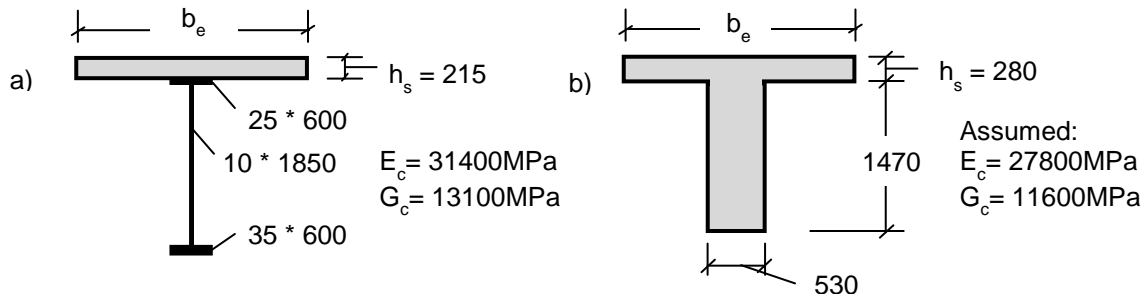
Typical floorbeam cross-sections: a) steel; b) concrete (dimensions in mm).
